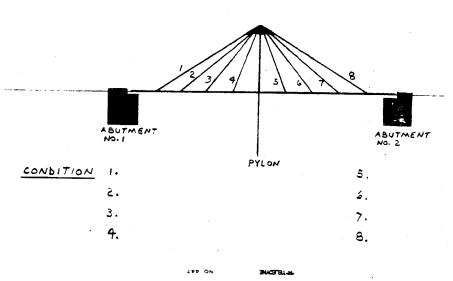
Form for Recording Defects in Cable System of a Cable-Stayed Bridge
